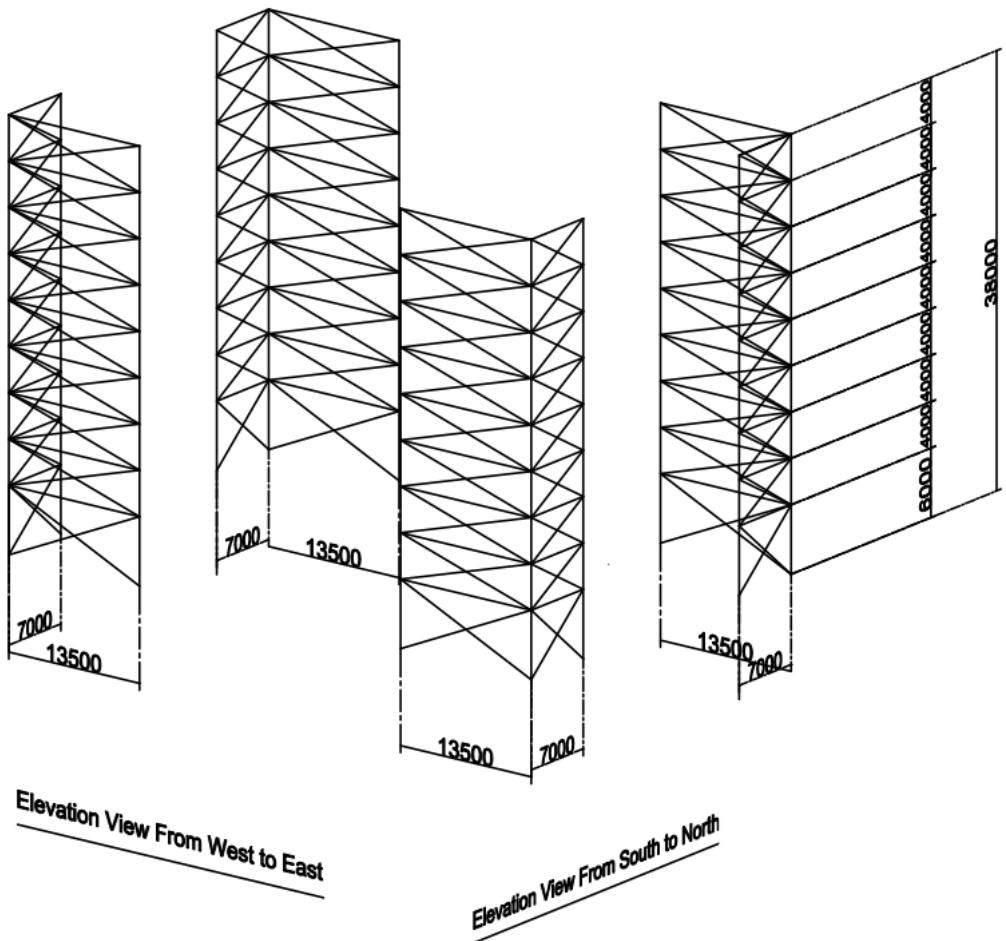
3D View for Global Bracing System in Proposal 1 (Autodesk CAD)
